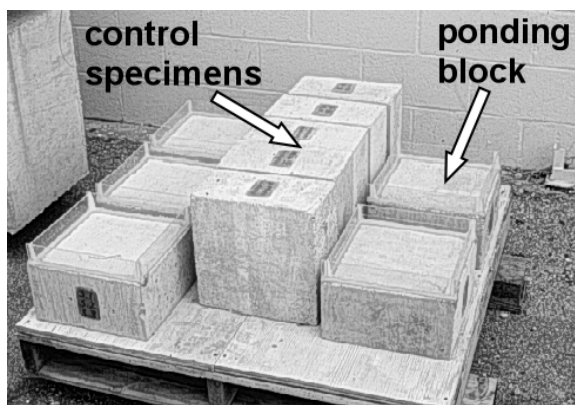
Beam Specimen Arrangement<sup>2</sup>
